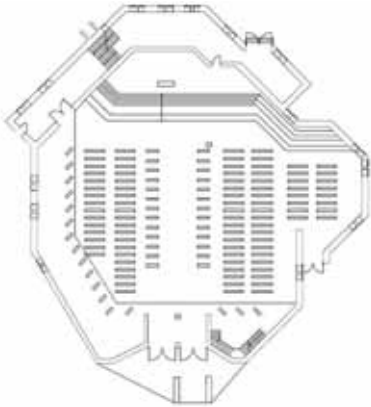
Ground floor of church of Saint Stanislaw in Czestochowa
